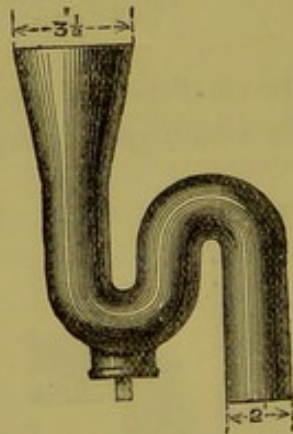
View of 2-in. S-trap with enlarged mouth.
